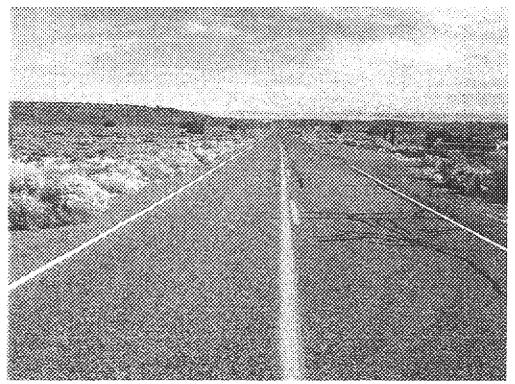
MP 15.24 S. Boundary of WUPA, Typical Pavement Distresses (looking back-chainage)
